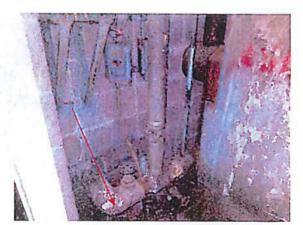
View of hard joints (HA-J) on boiler piping throughout the building.
